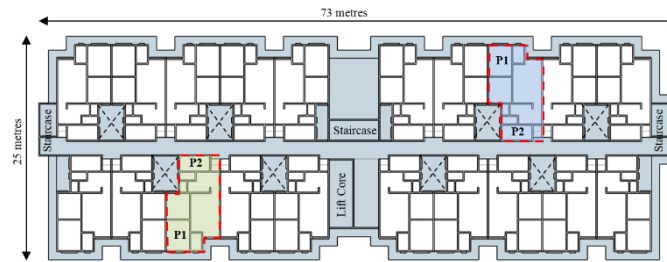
Typical floor plan of the PPR Seri Aman (a second generation building).
